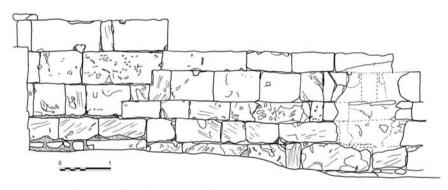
Elevation of South Fortress Wall near Tower 7
